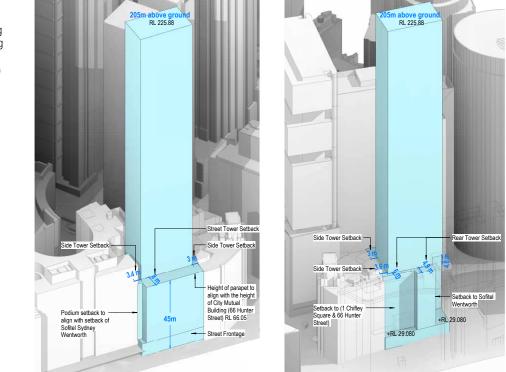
Indicative Building Envelope Massing (Bligh Street frontage and rear)
